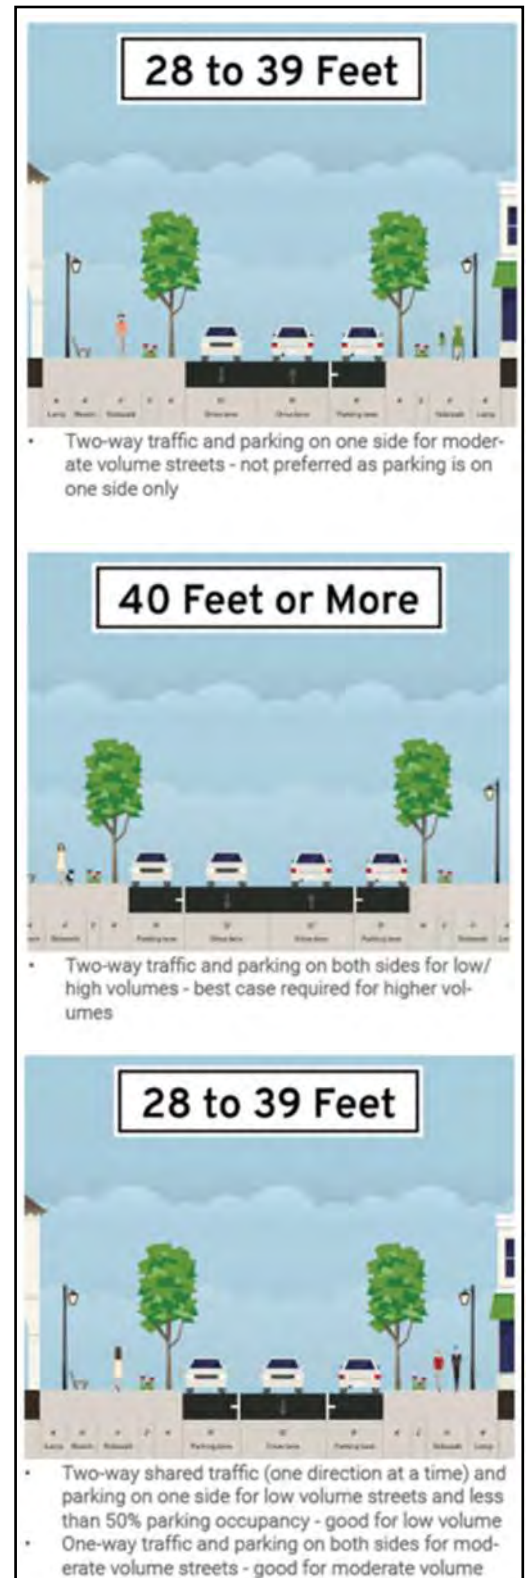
Recommended On-Street Parking Configurations for Roads with Widths that Marginally Support or Do Not Support On-Street Parking
